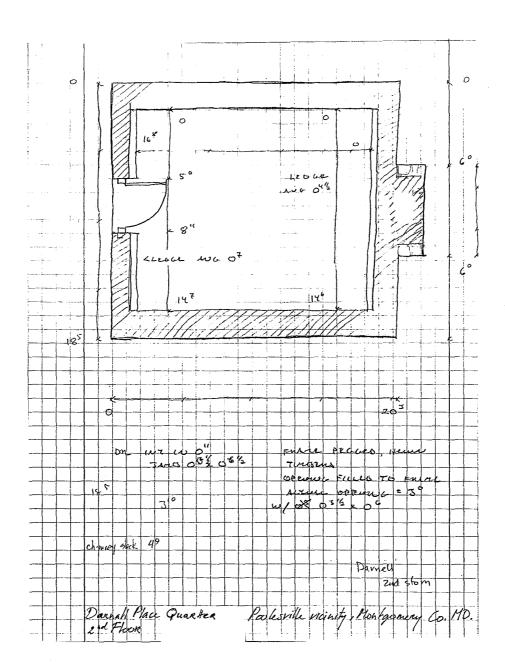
Darnall Farm Quarter, field notes for second floor plan.
